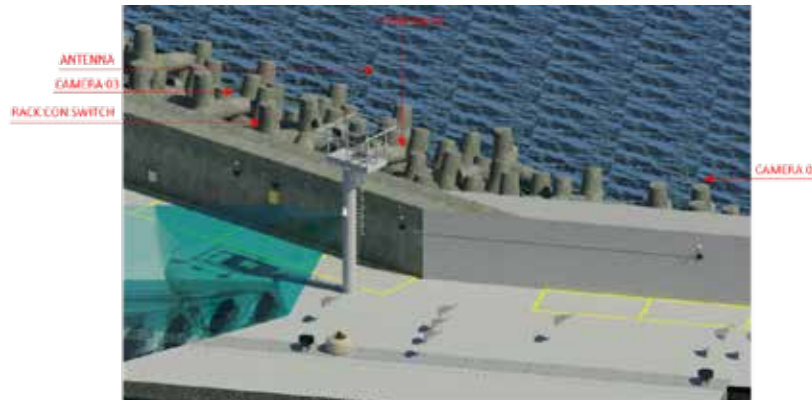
View from the installed on-site plant structure model in isometric perspective.
